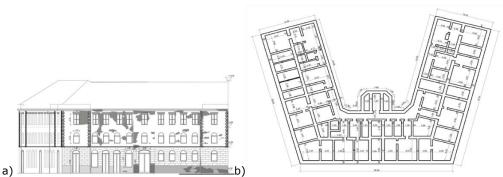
Survey of Elite's Palace: a) main façade; b) basement plan [252]
